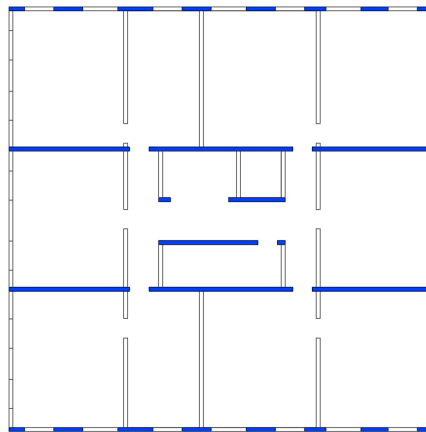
Floor plan showing structural walls with stiffness in x-direction used for a simplified hand calculation.
